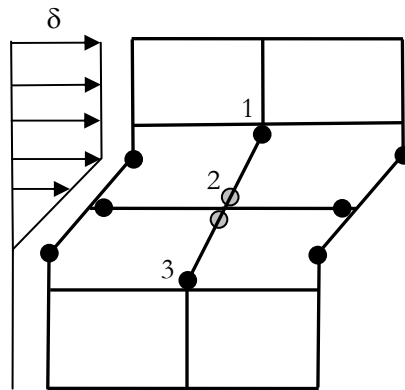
Mechanism with unavoidable hinges at intermediate locations of walls and columns
